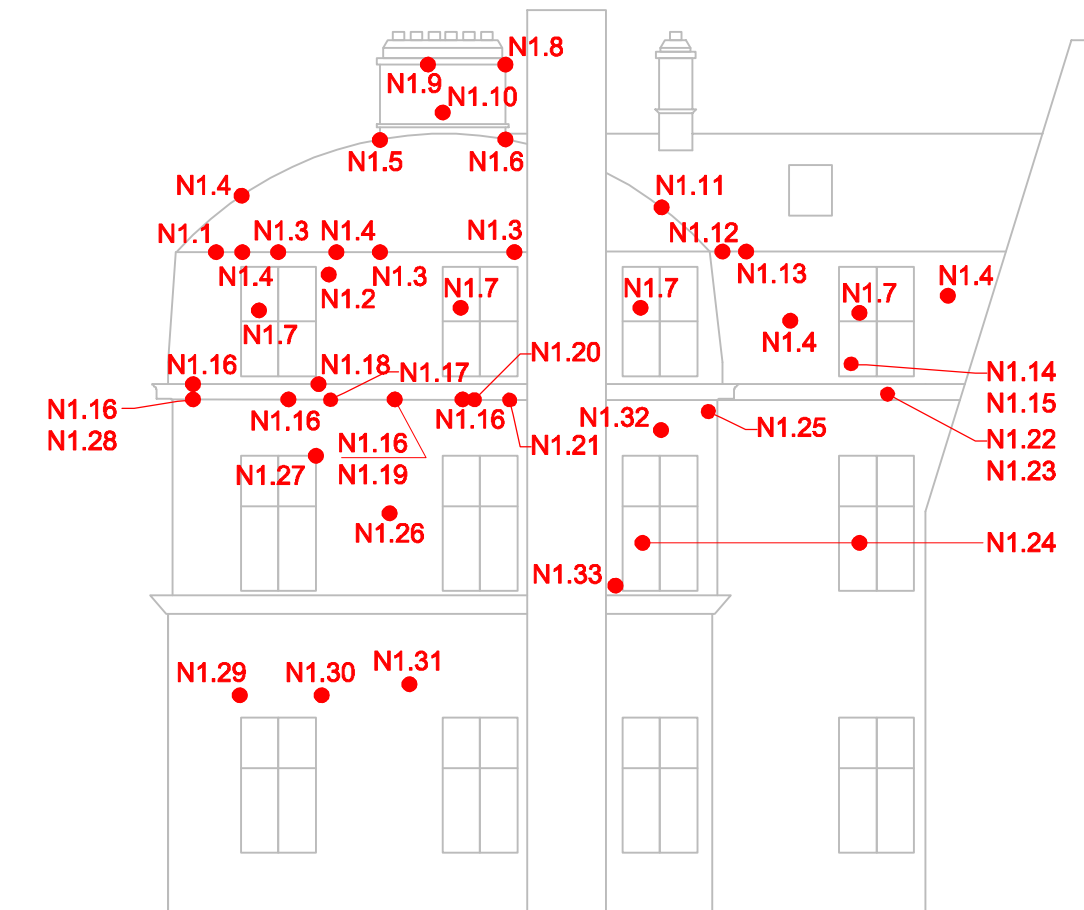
Elevation N1 of Station Hotel Building showing Defect/Observation Locations
